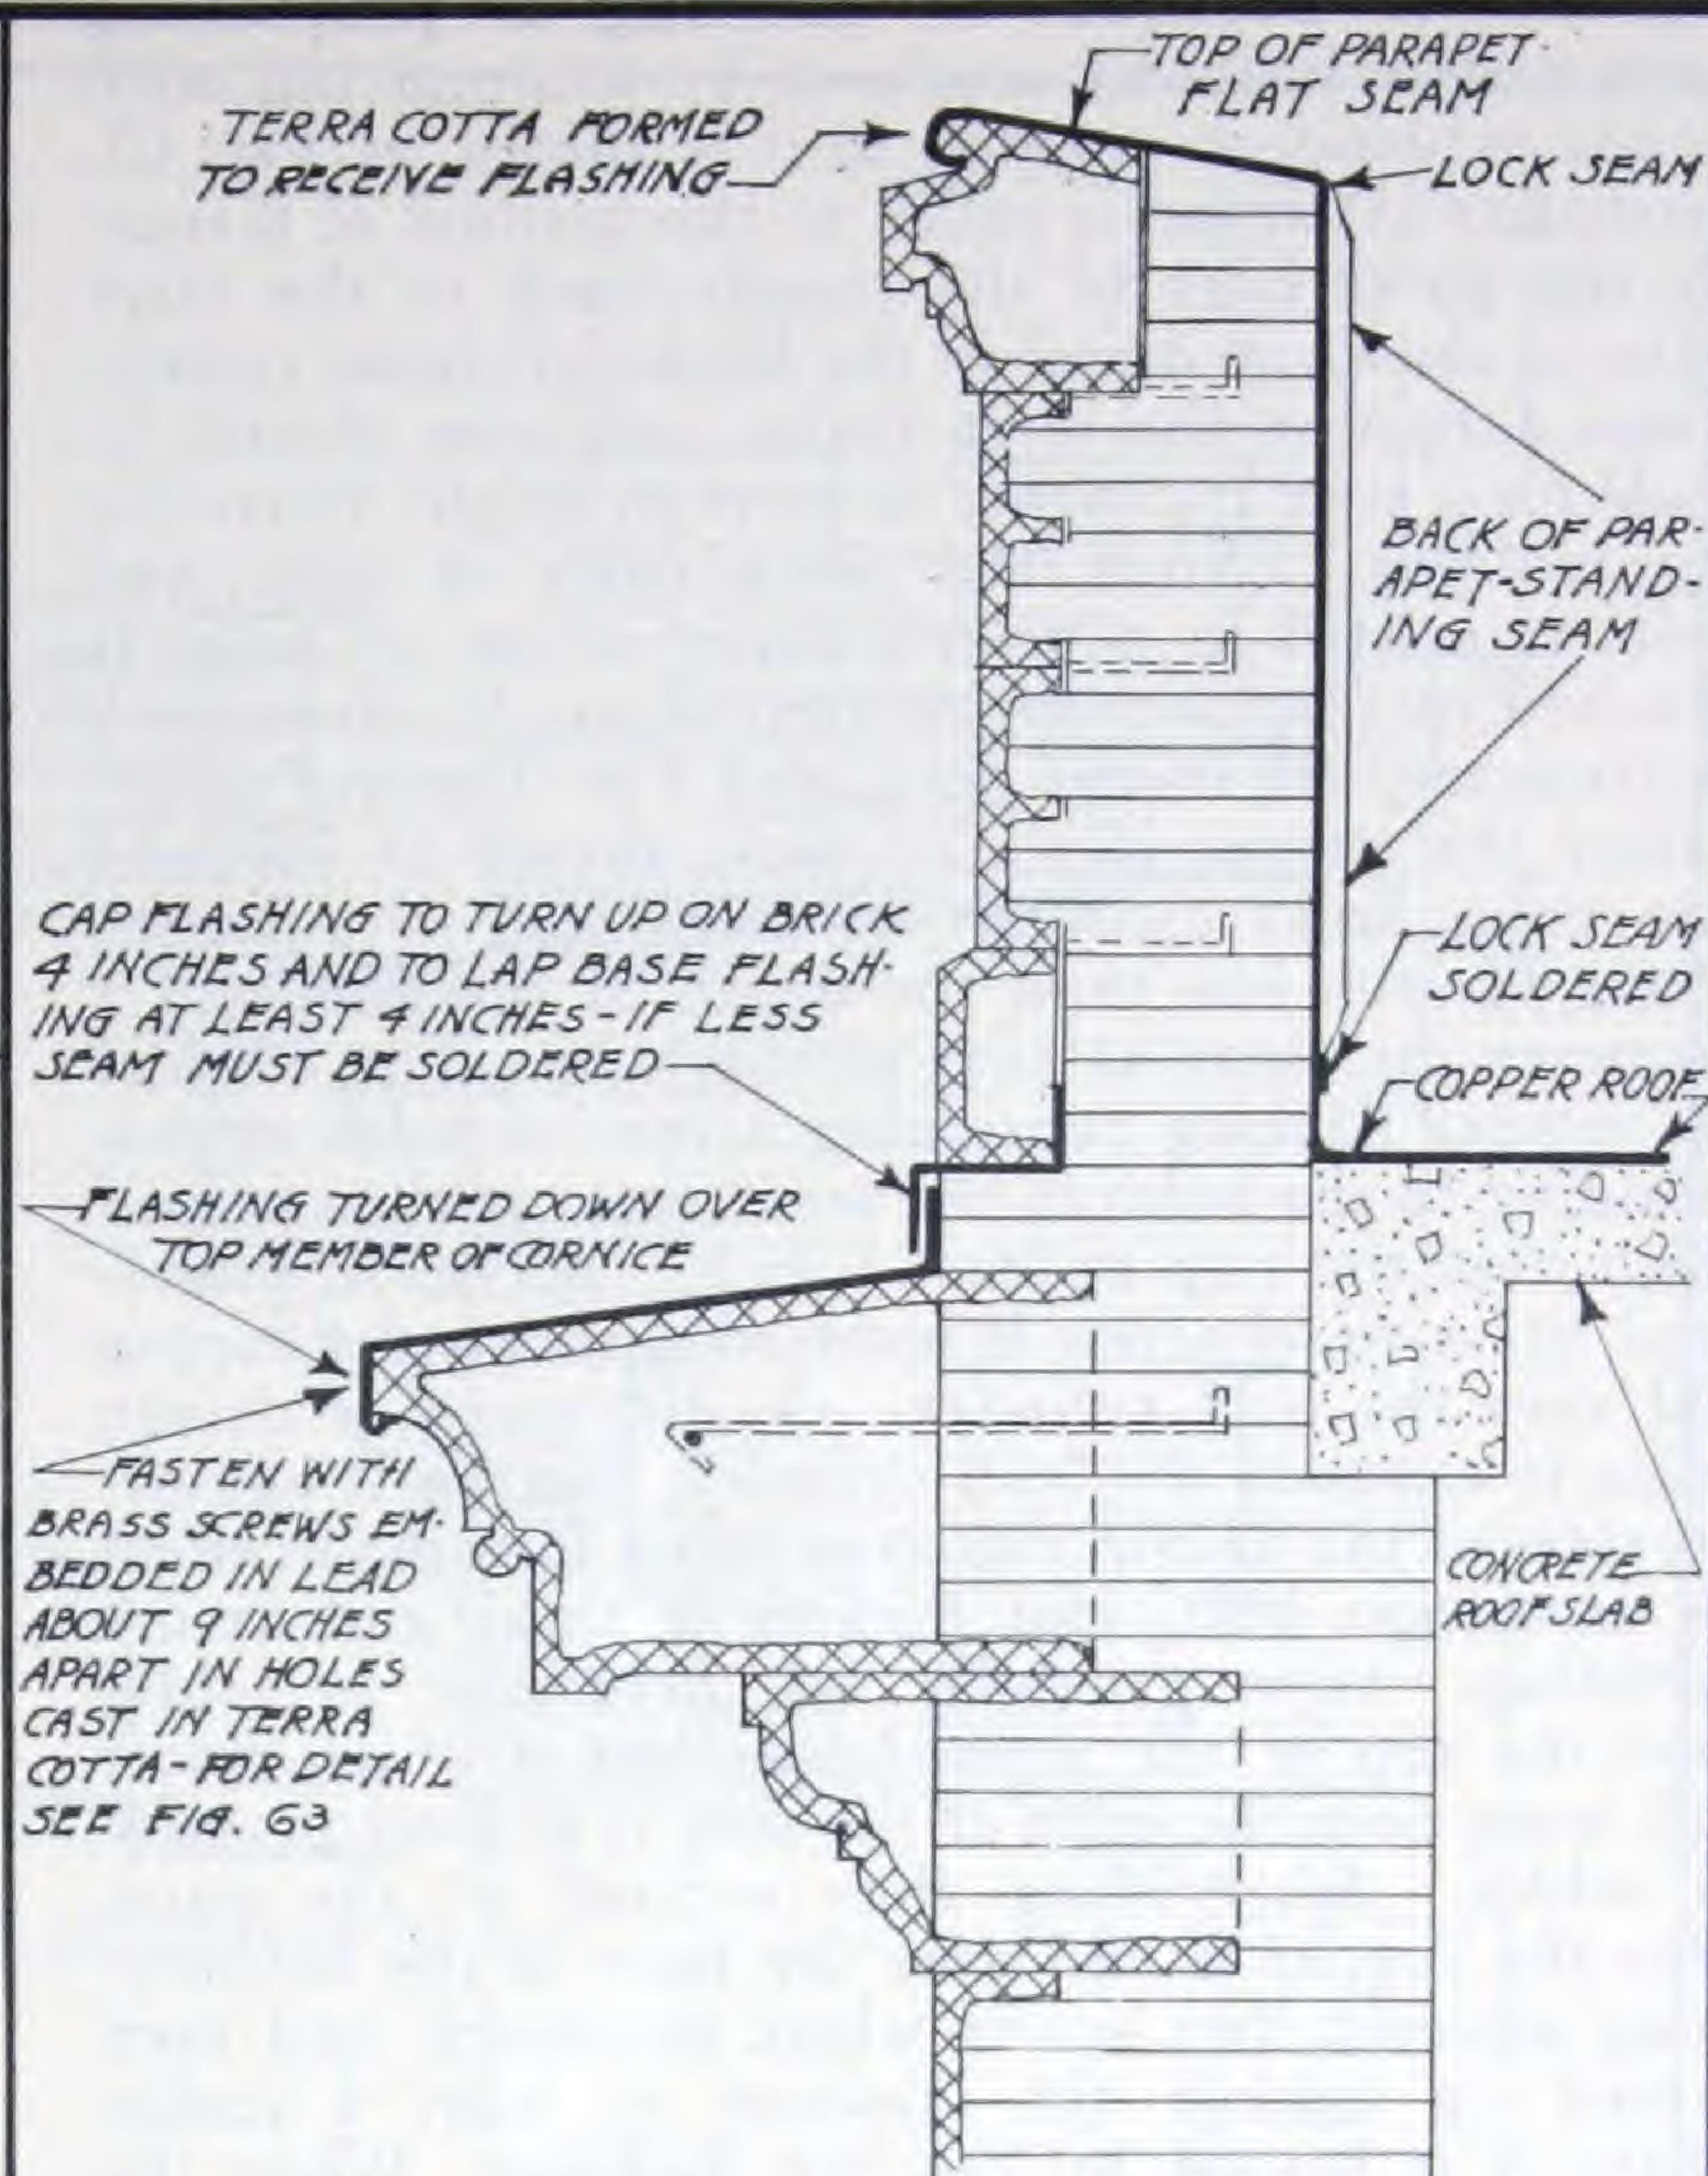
Another method of forming a gutter in a terra-cotta cornice surmounted by a brick parapet-wall faced with terra cotta is shown in Fig. 61. The flashing is continued through the wall beneath the terra-cotta cap to prevent seepage and continues down on the inside of the parapet and is formed with vertical standing seams (see Fig. 60) and connected to the main roof copper by a soldered lock seam. Attention is called to the key formed in the masonry below the terra-cotta cap which is made as described in detail in Fig. 59. The cornice flashing, forming also the gutter-lining, is formed on its outer edge over a terra-cotta roll (as described in detail in Fig. 60) and extends back on the masonry, avoiding all sharp angles, to the brick wall where it is turned up on the wall high enough so that the top will be at least 3 inches above the highest part of the outside of the terra-cotta cornice. For gutters over 2 feet wide a soldered lock seam should be formed longitudinally in the middle of gutter. This seam is secured by cleats nailed to wood strips set in the concrete. (A method of connecting a gutter of this type to the drainage-system is described in Fig. 53.) The cap flashing is laid at the back of the terra-cotta facing of the parapet about 3 inches up on the wall, and extends out under the terra cotta to the outside, where it is turned down 4 inches over the gutter-lining. If this lap is soldered the distance may be reduced accordingly.
